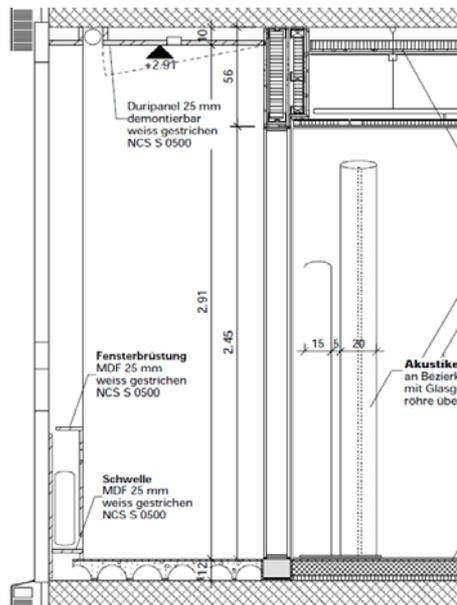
Vertical section through typical glass-wall construction (corridor along façade to the left, studio to the right) [1]
